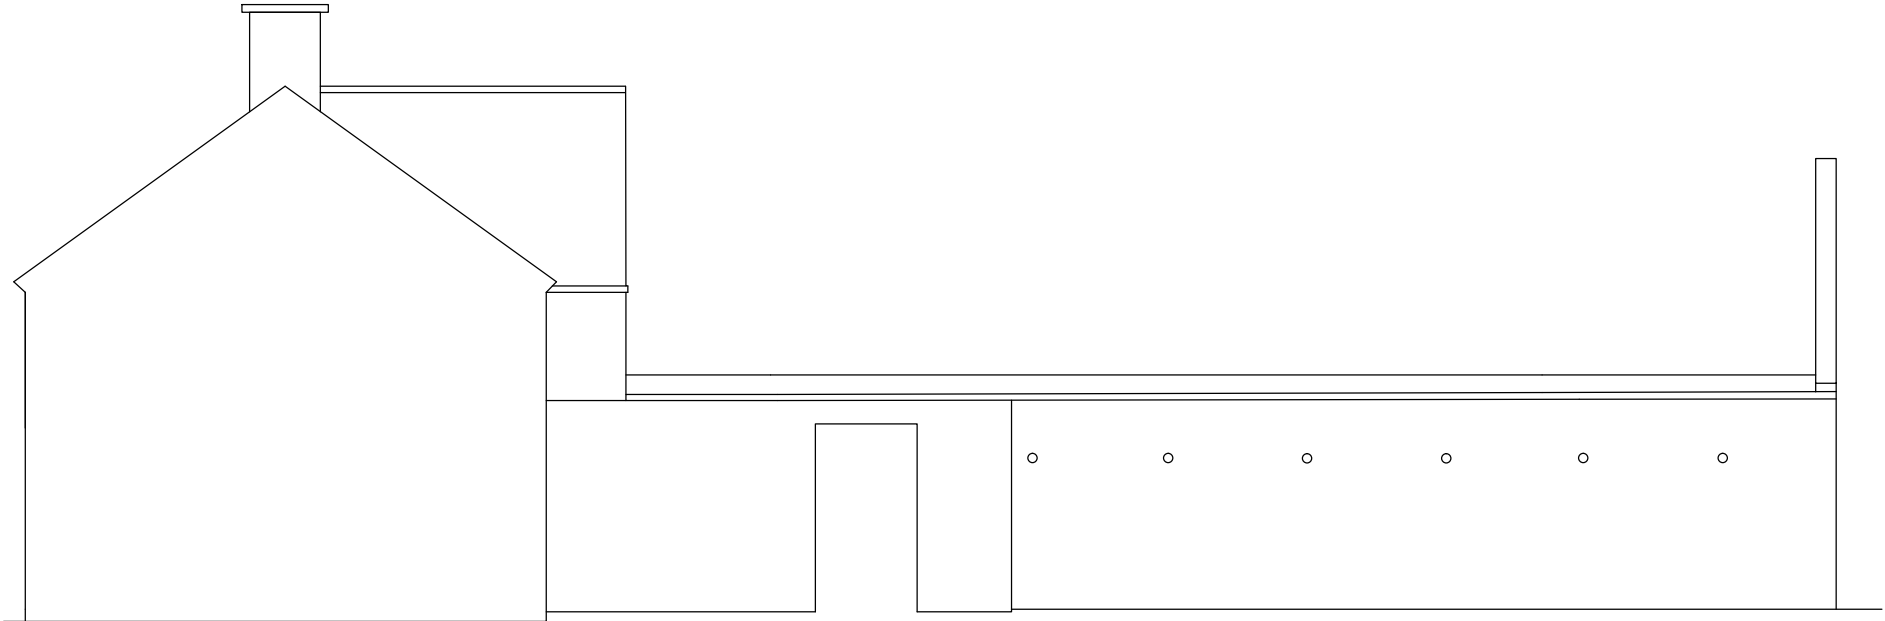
West facing elevation of Buildings 1, 2 & 3
